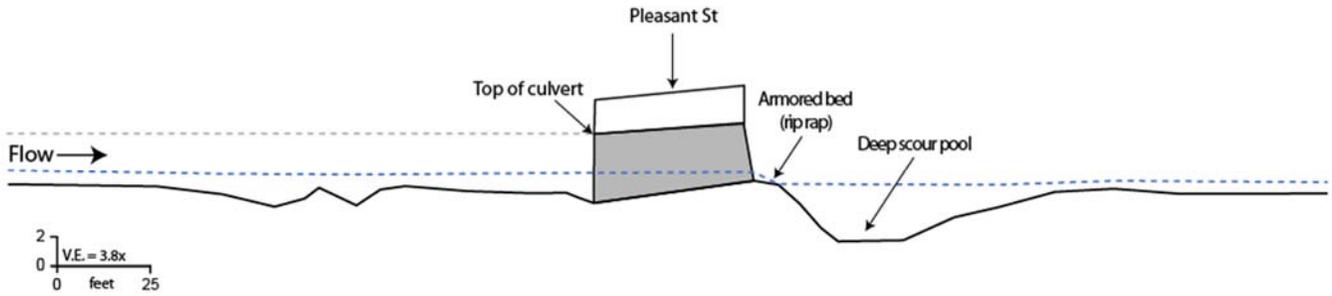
Longitudinal profile surveyed through Pleasant St crossing showing higher bed elevation at the culvert outlet than inlet upstream and a deep scour pool that has developed downstream of the undersized crossing
